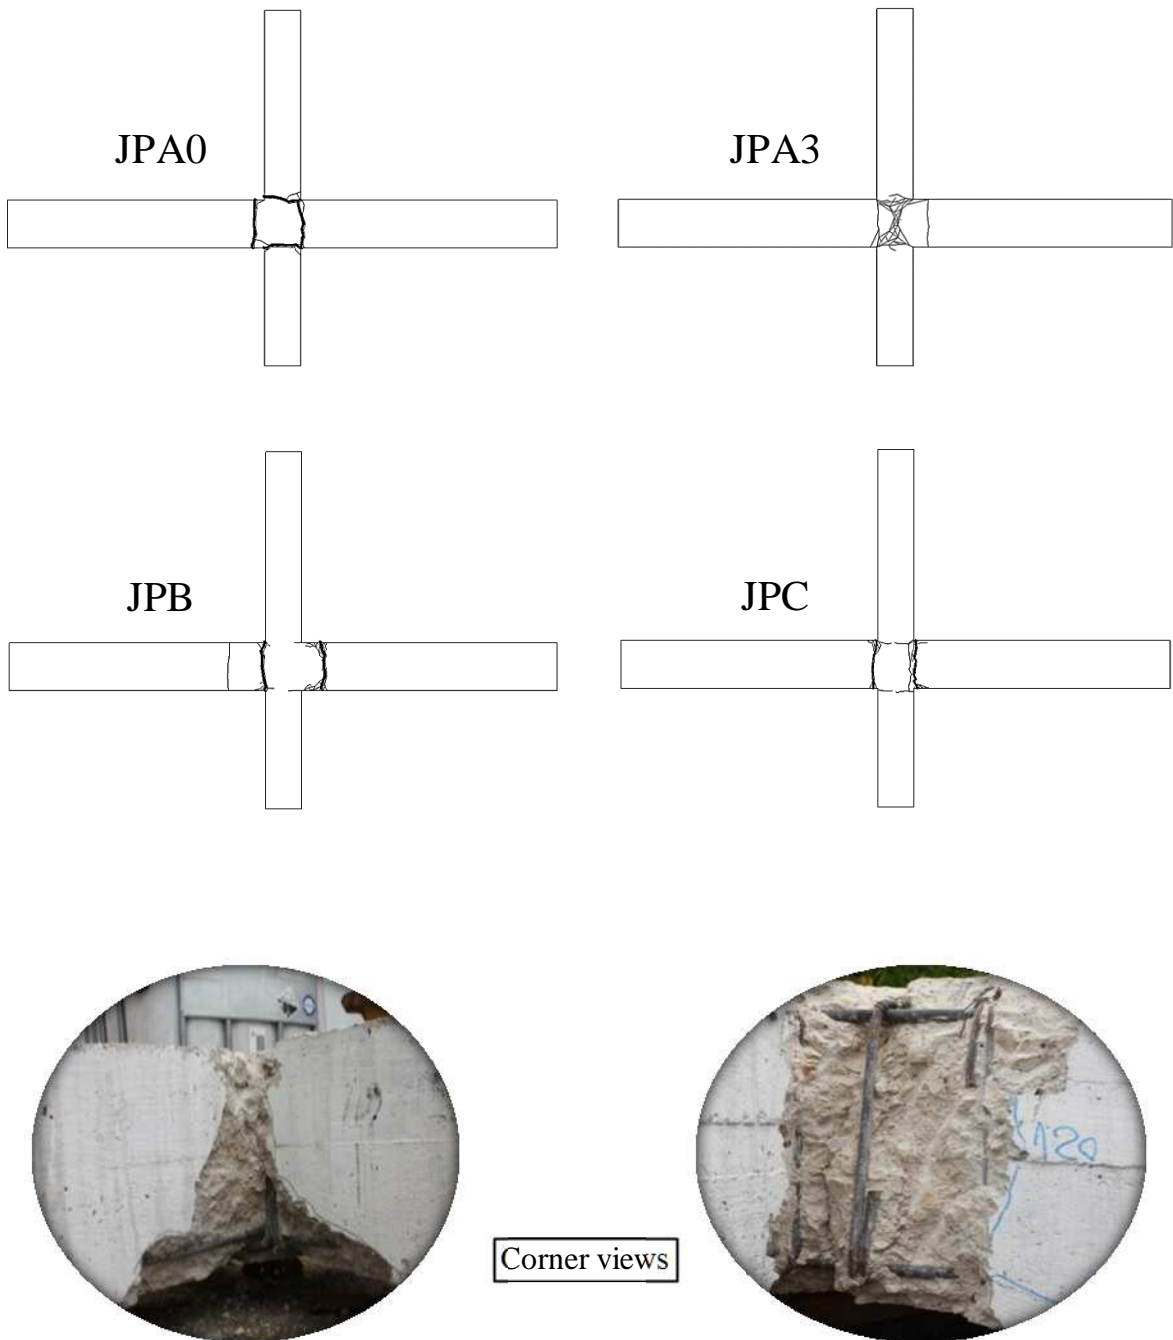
Plan view of schematic presentation of damages in the selected beam-column joints along with typical damages observed in corner views of the specimens
